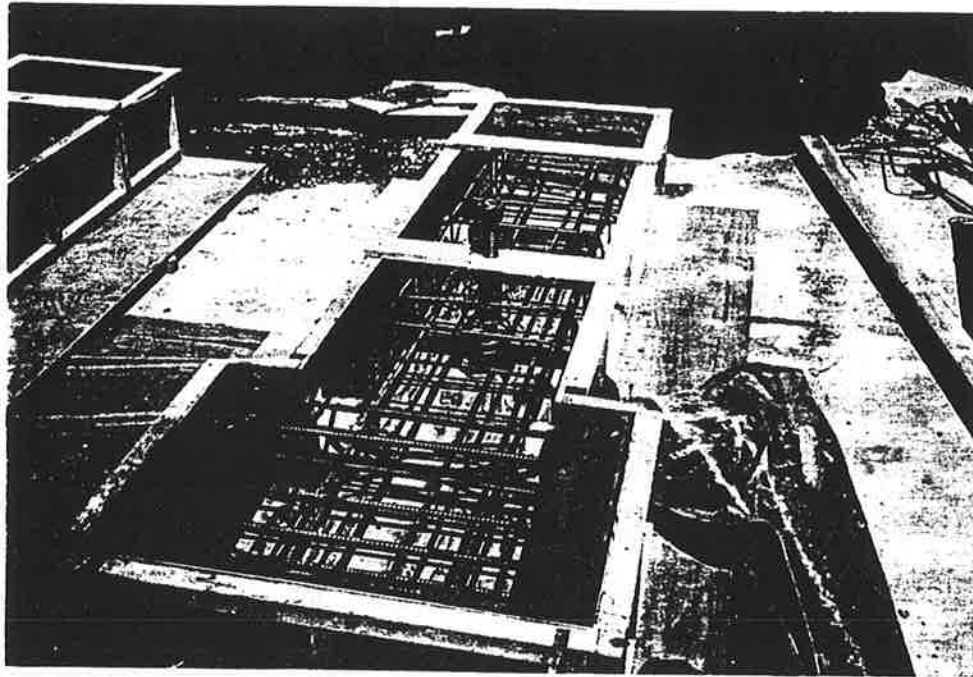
Formwork and Reinforcement for Series 7 Specimens
